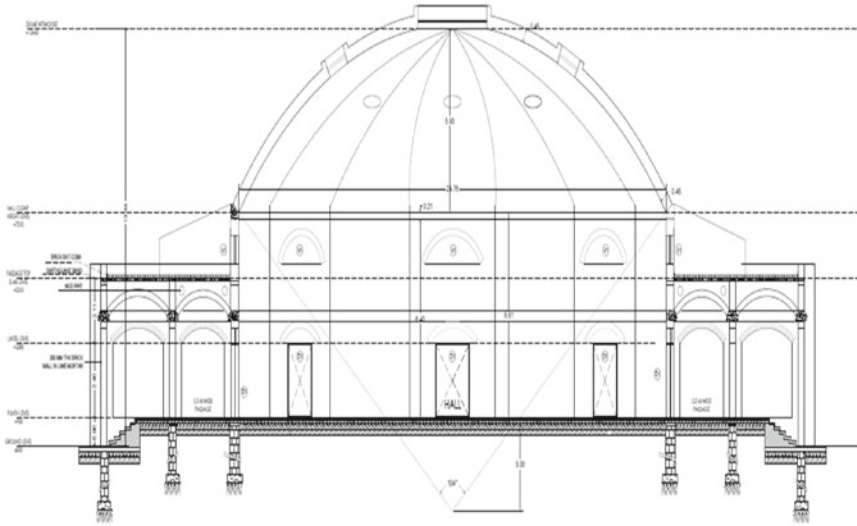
Elevation of masonry dome. (Courtesy: Nandadeep Designers and Valuers Pvt Ltd, Aurangabad)
